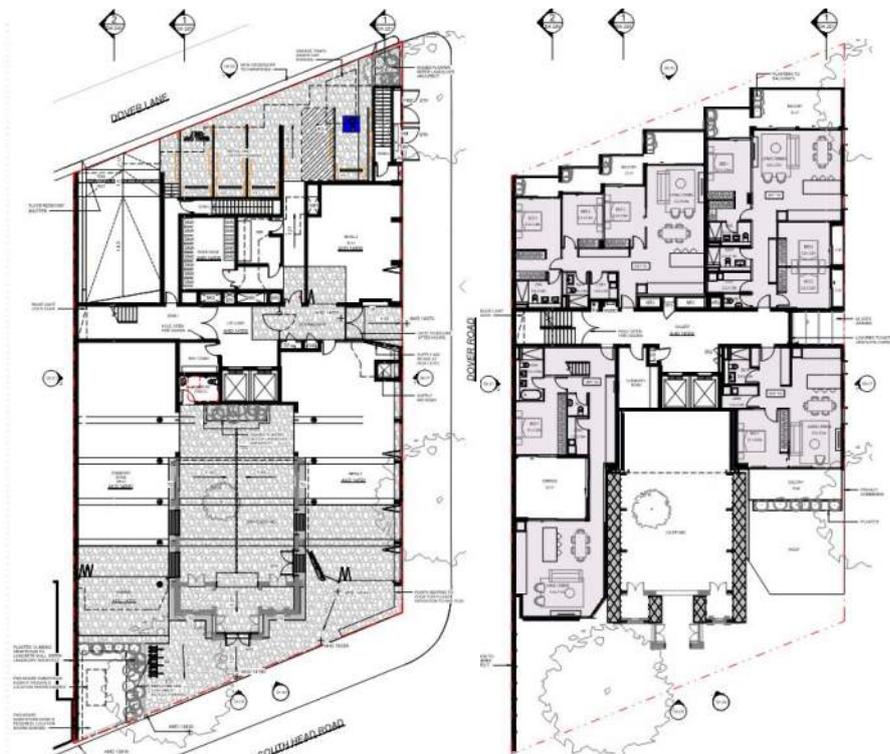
Ground Floor Plan (left), and Level 1 Plan (right).
